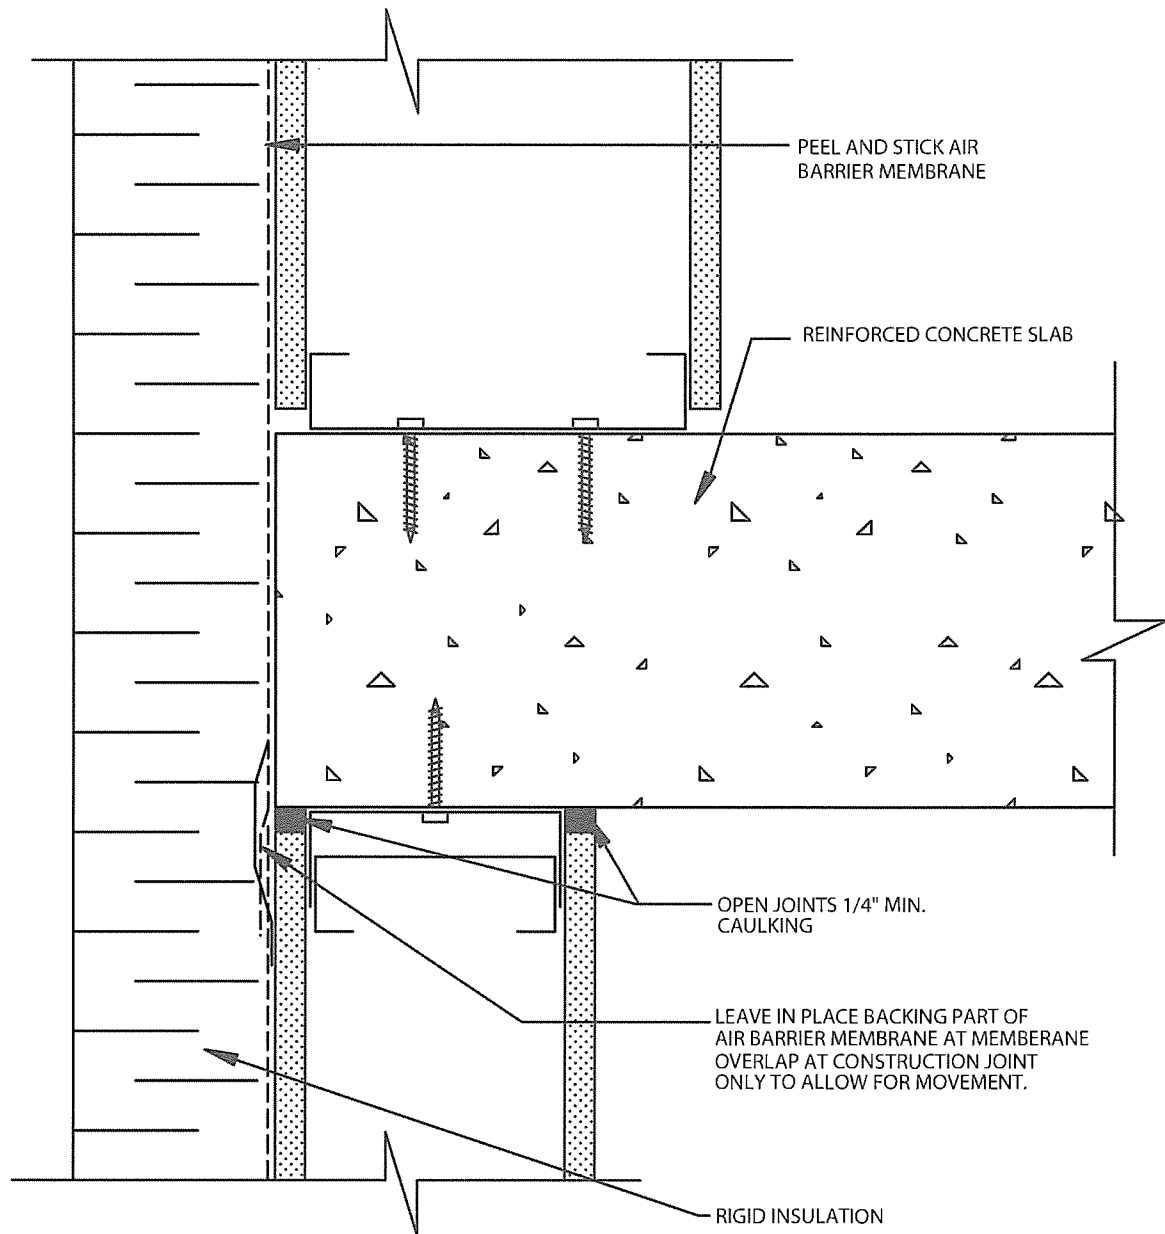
ACRYLIC STUCCO/STEEL STUD
